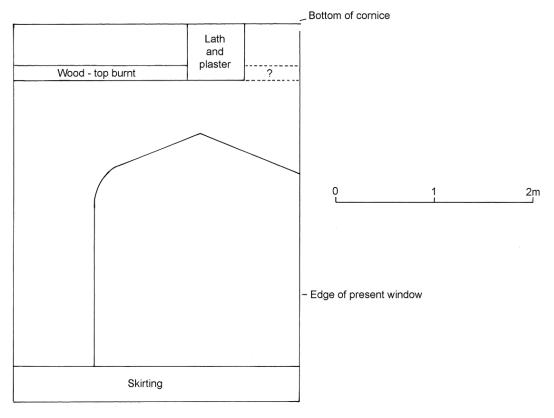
Part of a blocked arch in the south wall of room 134 on 1 September 1986.
